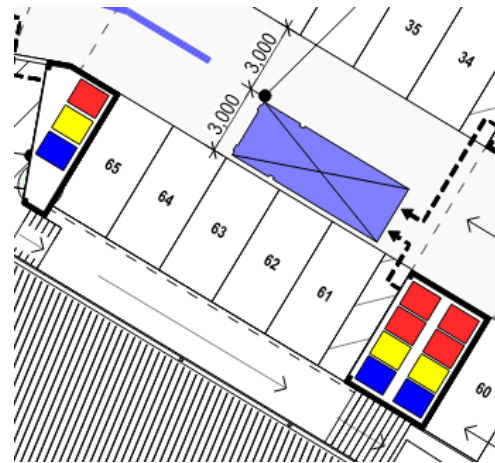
Example of floor plan of proposed waste storage (source: EJE Architects, 01/12/2023)
